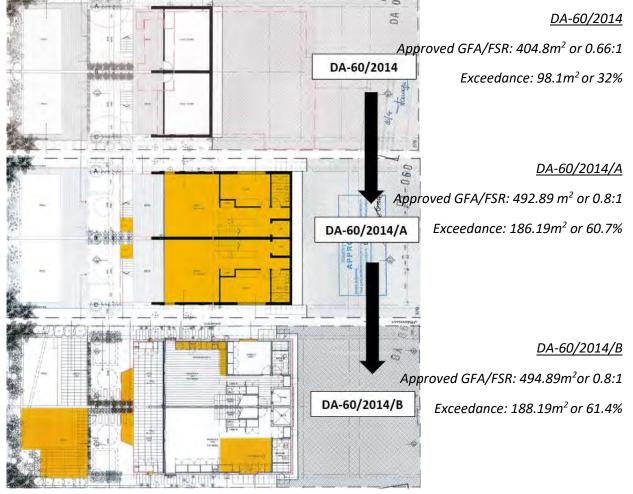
Changes to the lower ground of 57 Wallangra Road.
